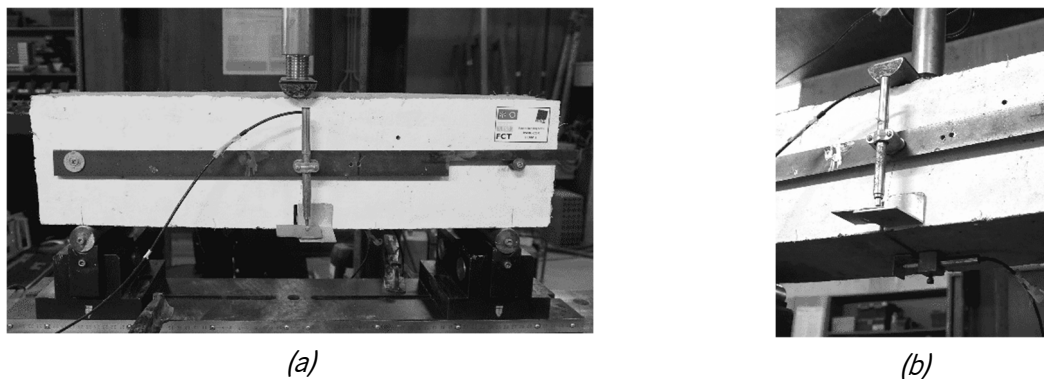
Test setup for 3PNBBT: (a) Specimen front view (b) Specimen bottom view
